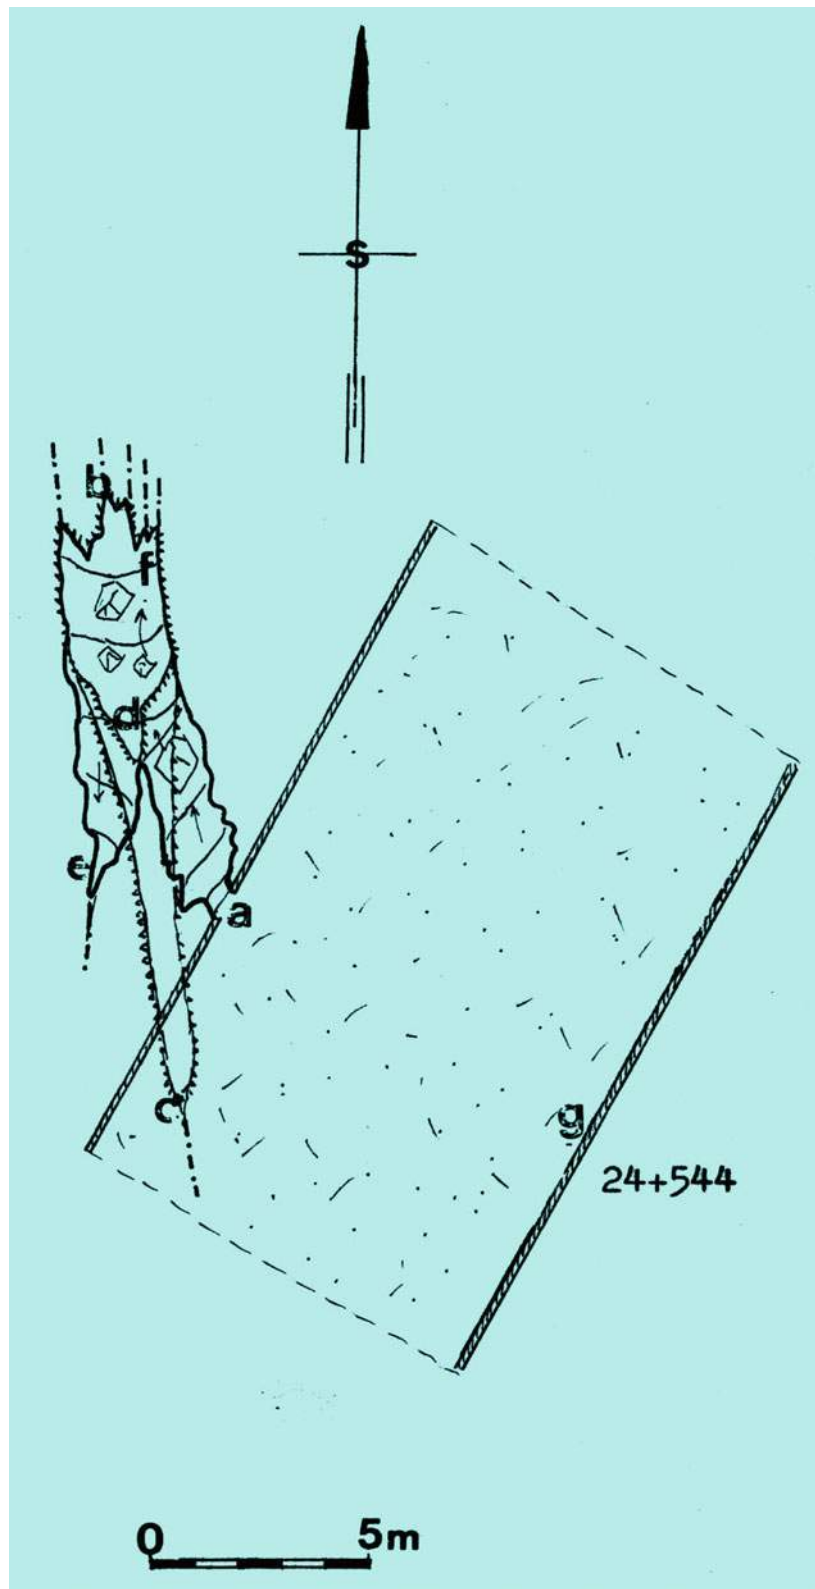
Plan of cavern at km 24 + 544 in Tuhobić Tunnel
